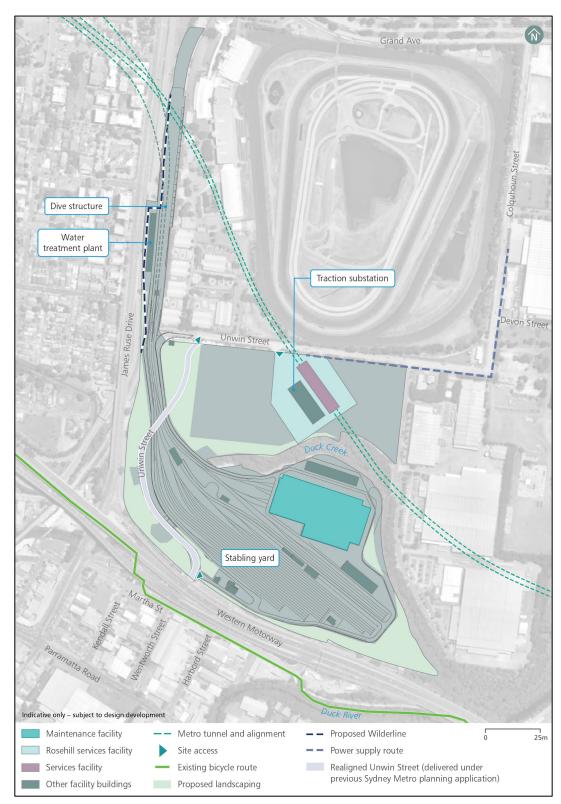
Clyde stabling and maintenance facility and Rosehill services facility indicative layout
